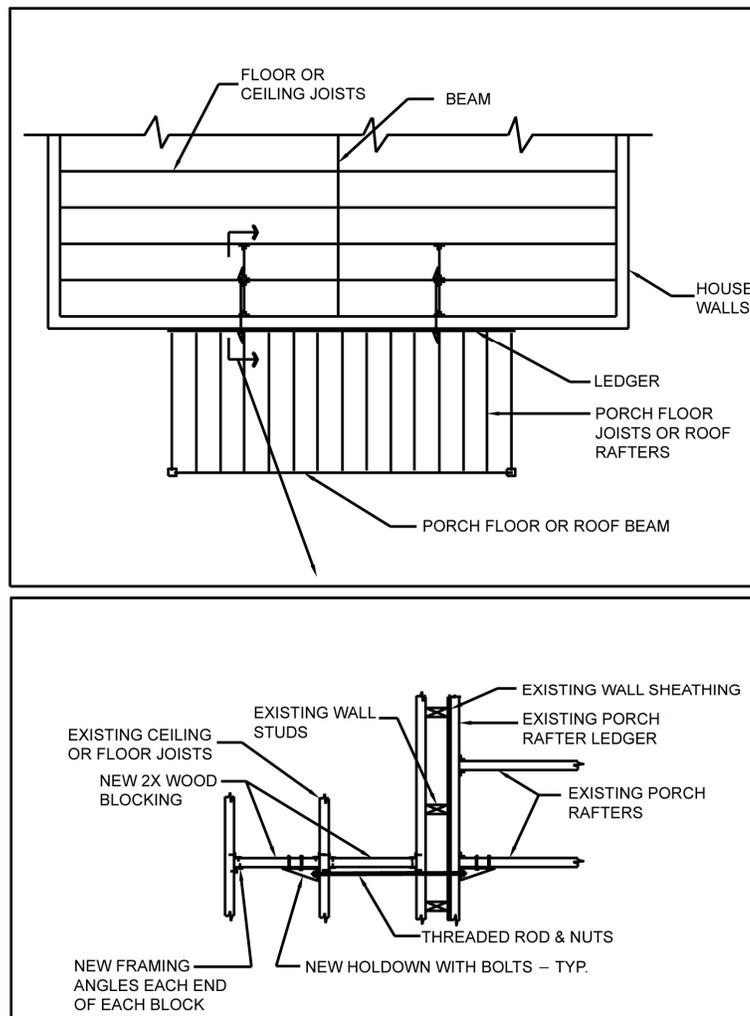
Retrofit connections of perpendicular porch roof framing to parallel joists within the house (from ATC, 2002).
